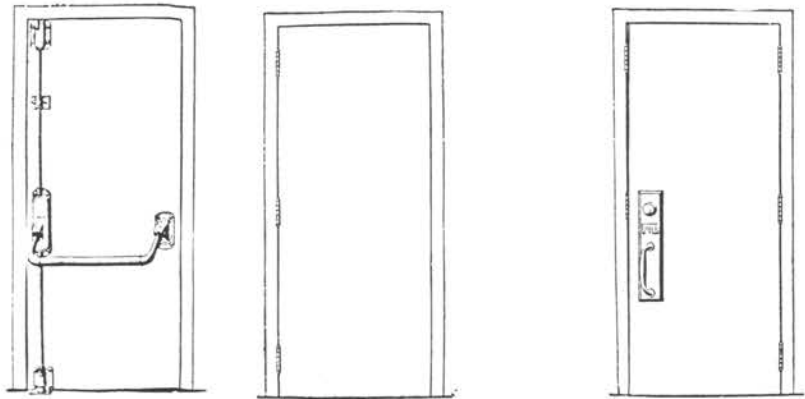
Fire exit bolt for doors used for entrance and exit opening out. Door pull on outside
